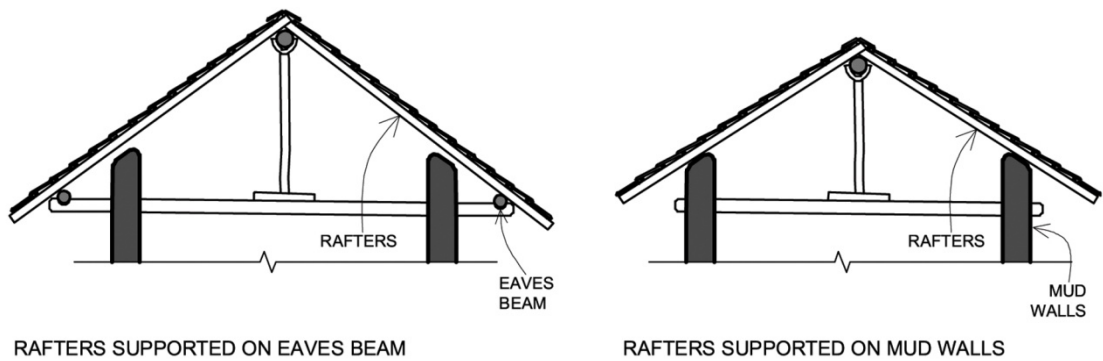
Comparison of roofs where rafters rest on eaves beams (left) and where they rest directly on the wall (right). Note the section on the left shows steeper slopes of the roof.
